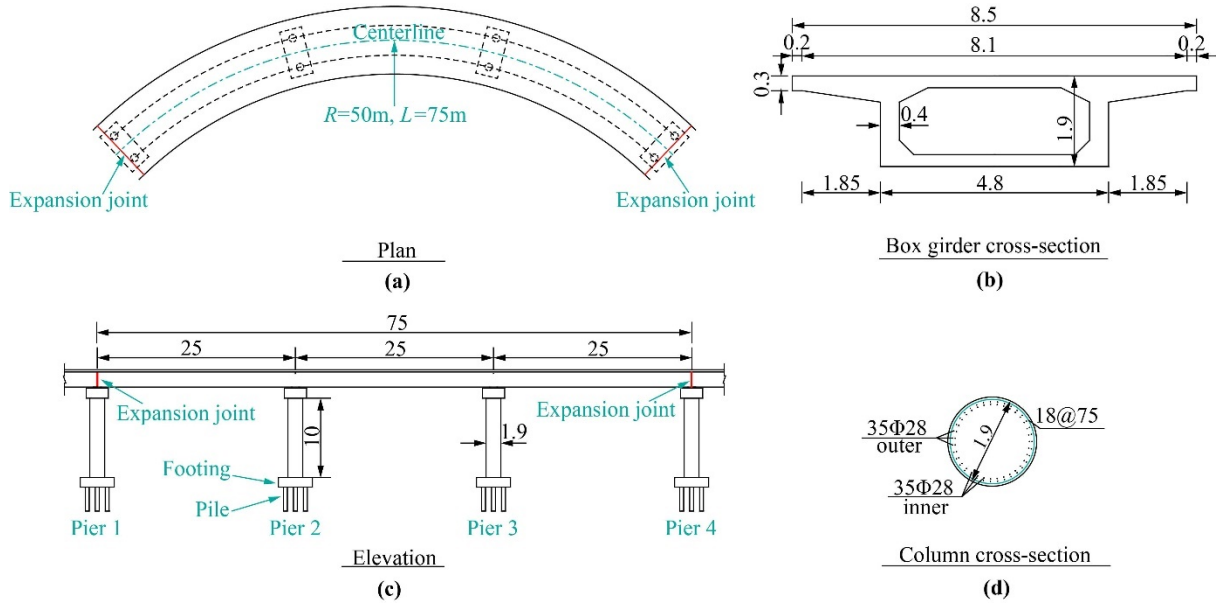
Configuration of the prototype (units: m): (a) plan, (b) box girder cross-section, (c) elevation, (d) pier cross-section.
